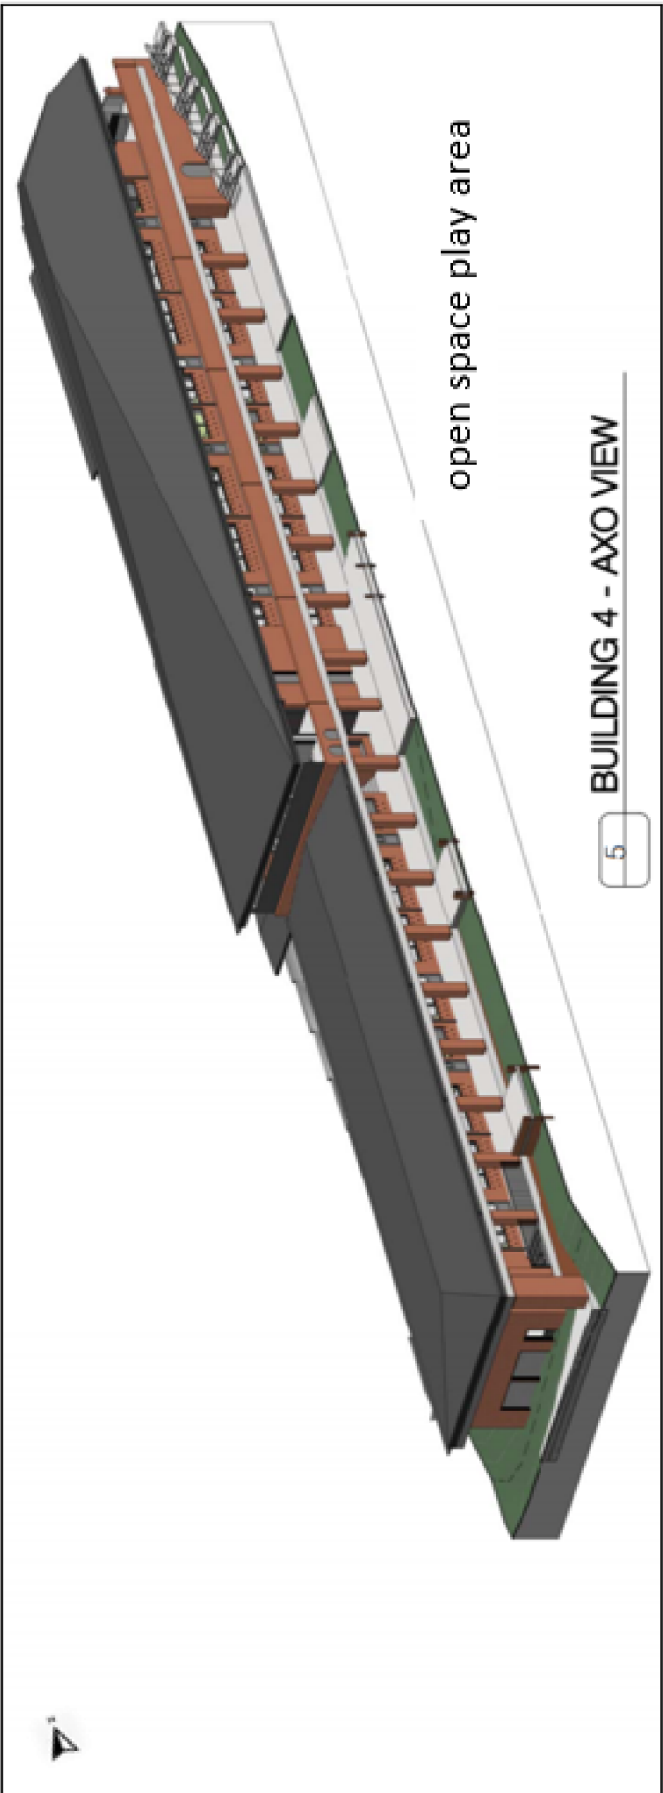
| View of Building 4 from the open space play area (Source: EIS 2021)
